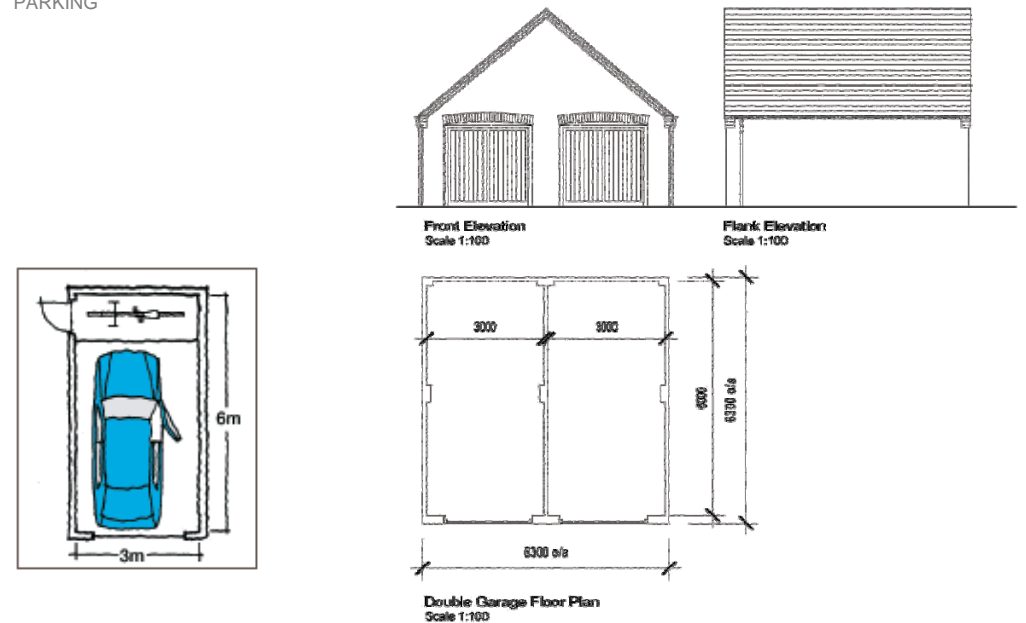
Guidance notes typical garage layout & dimensions Fig. 3.33
